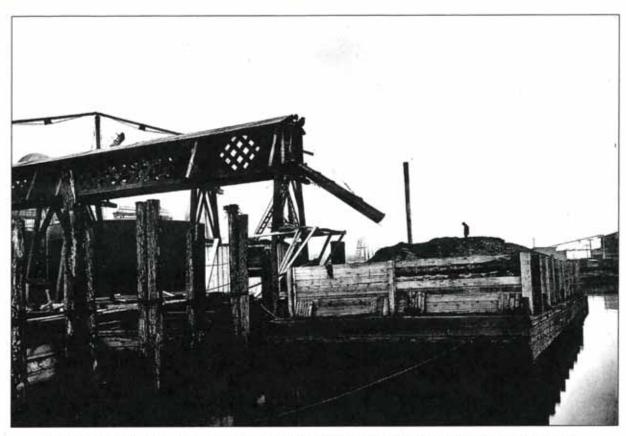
A. Storage tank (left half of photo) at the former creosoting plant site.
